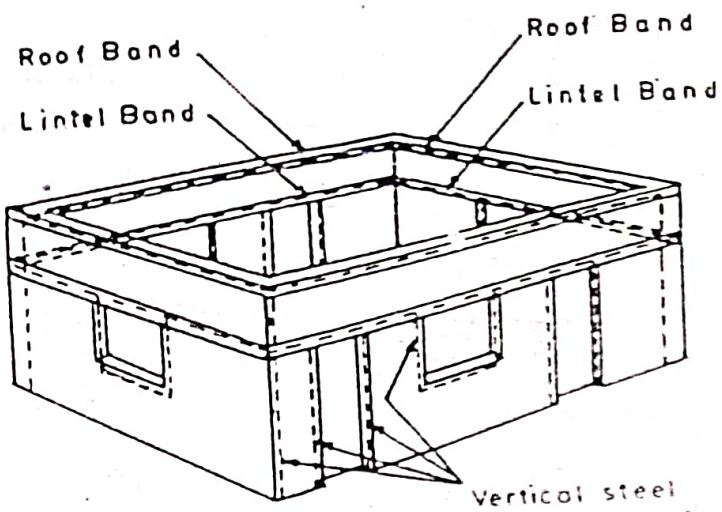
(a) Overall arrangement of reinforcing masonry building
